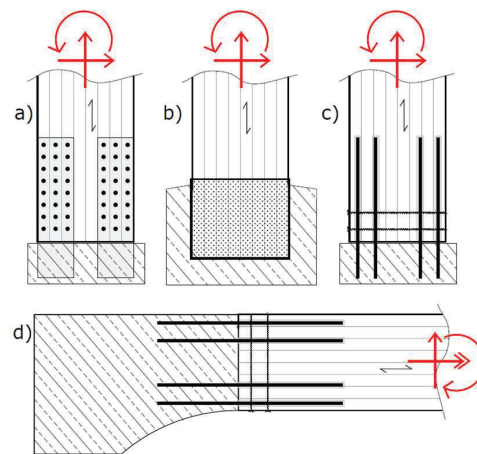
Rigid glulam to concrete connection alternatives a) dowelled timber steel plate joint b) joint grouted in bucket foundation c), d) glued-in steel rods with lateral reinforcement for columns (c) and bridge decks/floors (d)
